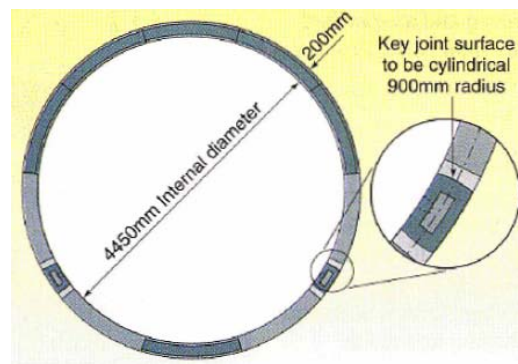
Cross-section of the precast concrete expanded tunnel lining, source: Davies, 1999 .
